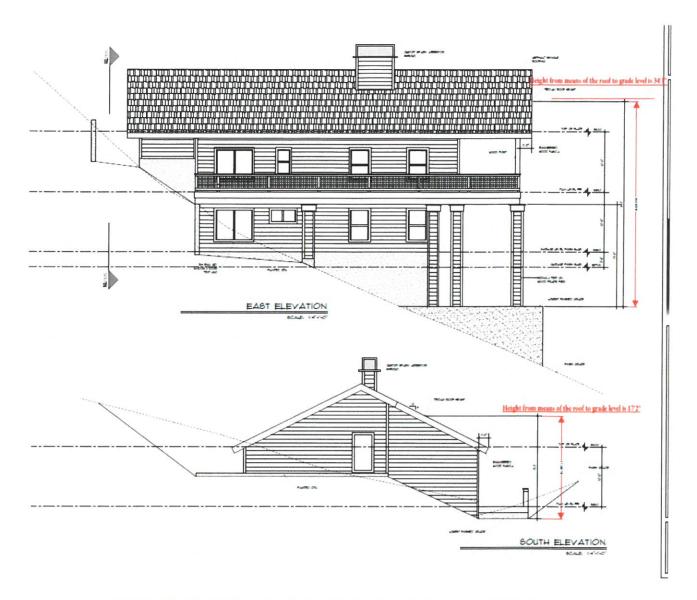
Revised East and South Elevation (reflects Planning and Zoning Commission recommendation)
